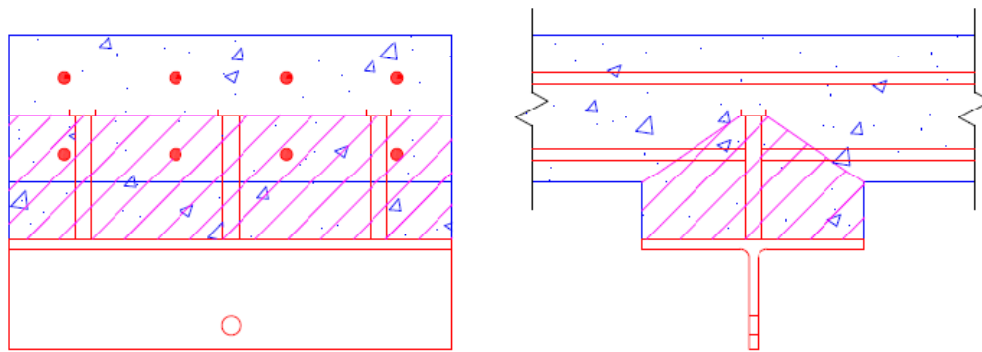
Failure Cone of a Stud Spaced Transversely, Showing Rebar near the edge of the Failure Surface
